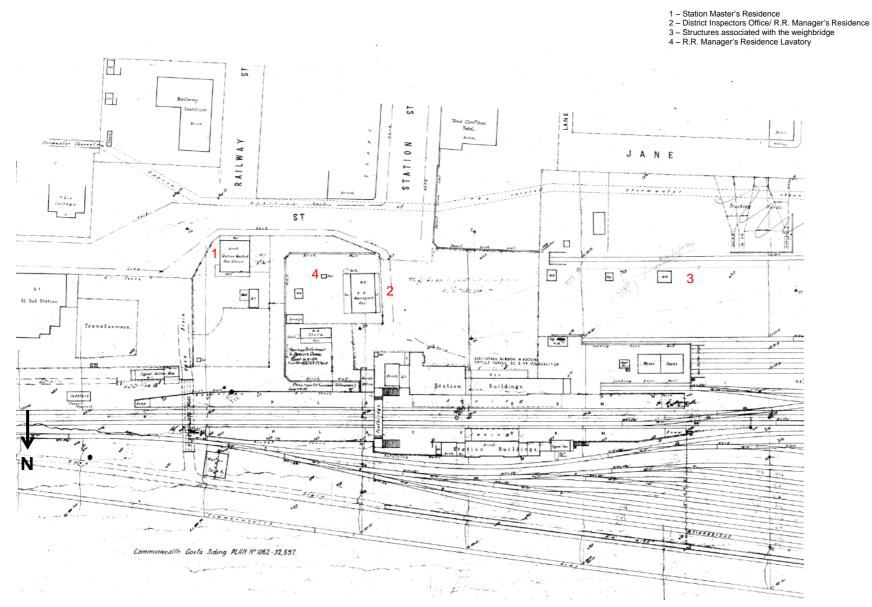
Excerpt from December 1943 plan "Penrith: Detail survey of station arrangements". Source: Sydney Trains Plan Room CV0236654
